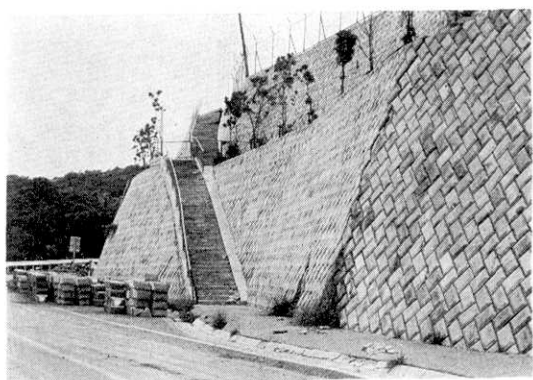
Cracks in a masonry retaining wall and the destruction of a step case at loc. G-34.
